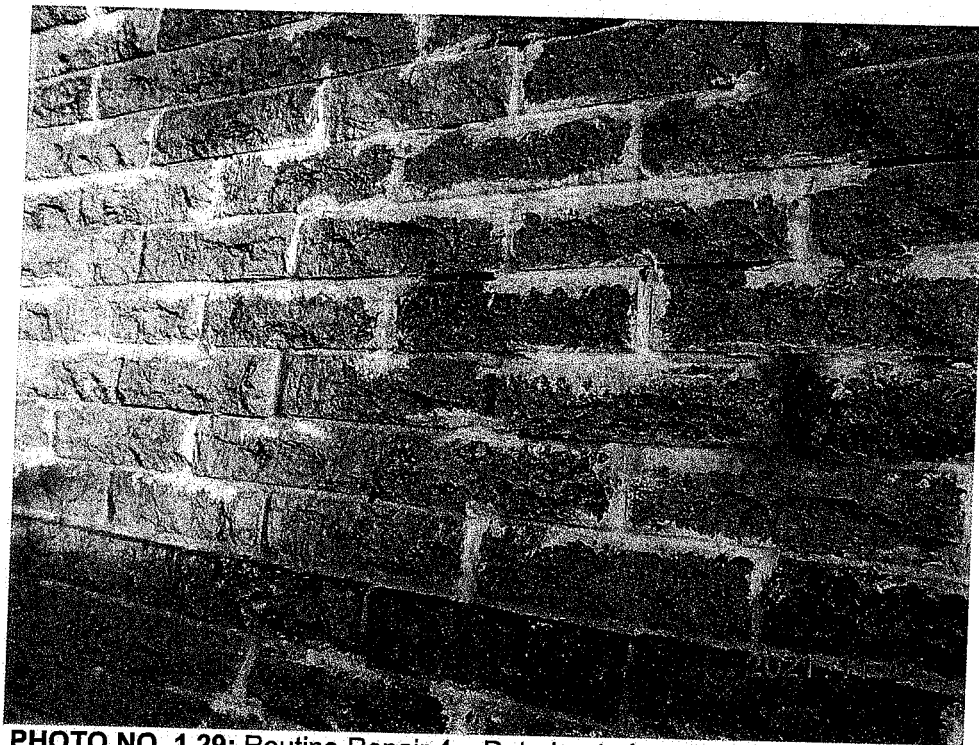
Routine Repair 4 – Deteriorated mortar joints and
